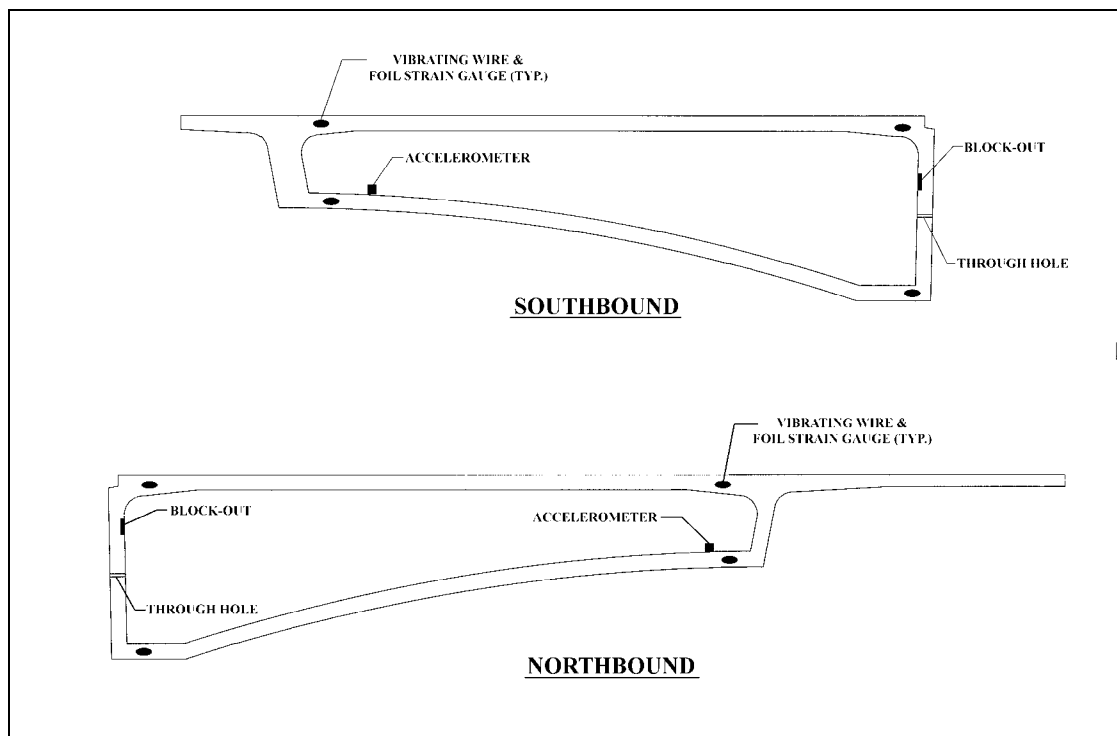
Roadway Segments Type-I Gauge Locations (Modified IRIB Specifications and Construction Plans)
